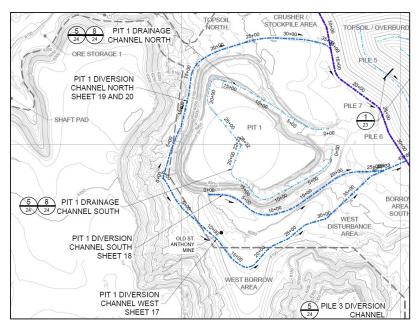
Pit 1 Drainage/Diversion Channel Layout 30% CCOP (Stantec, 2022)
